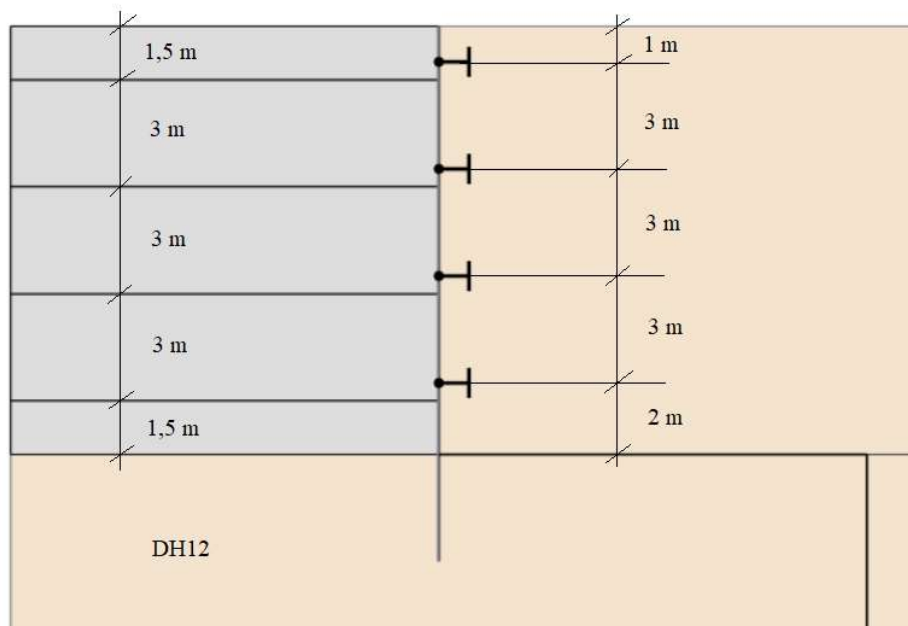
Geometry of constraint placement and excavation phases for concrete diaphragm and excavation depth of 12 m.
